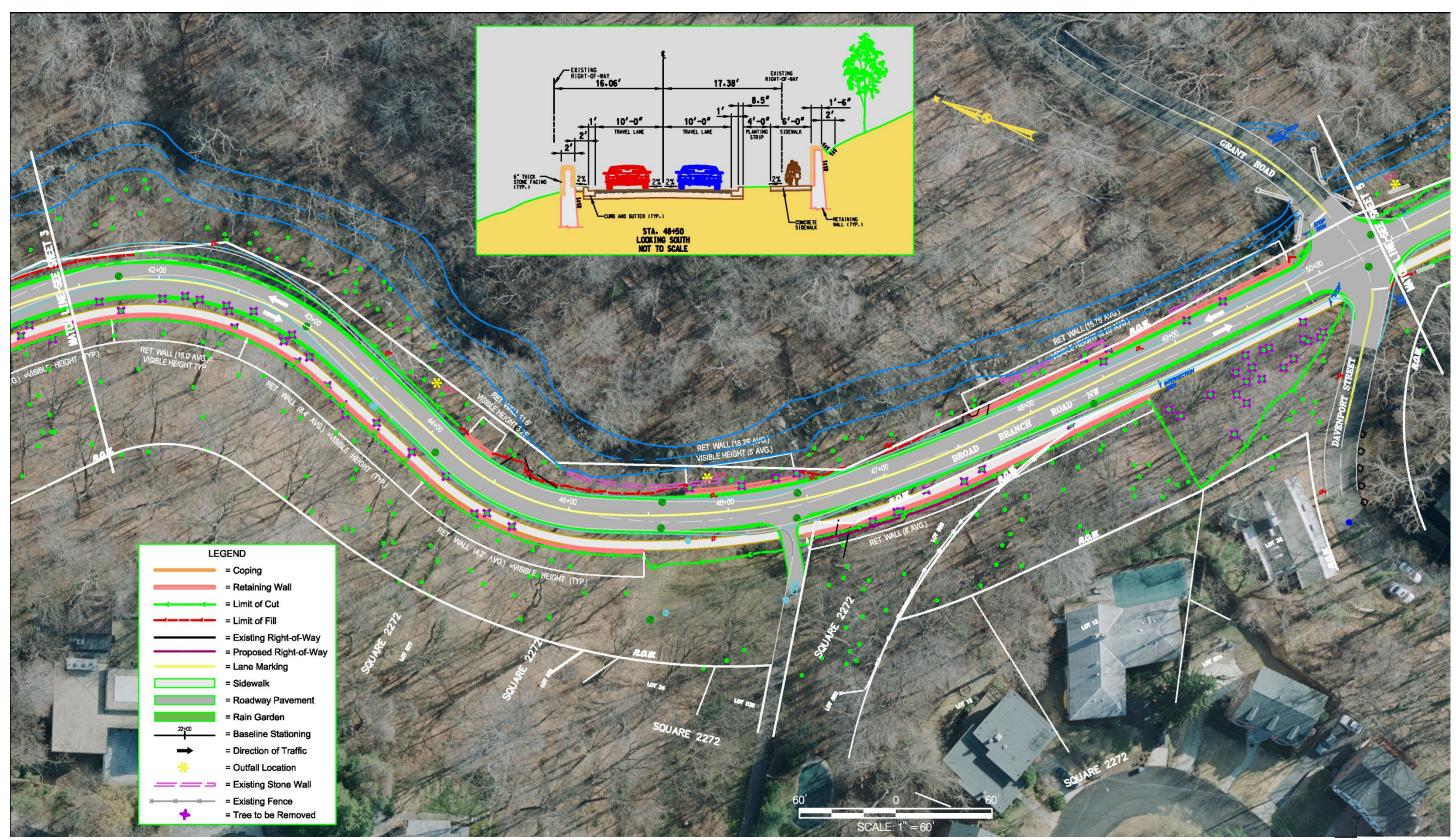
Alternative 3 Modified (Sheet 4 of 9)
